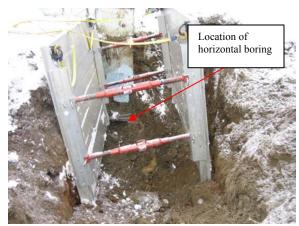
Installation of Vapor Point (VP-1) in EA-2 - view to south
